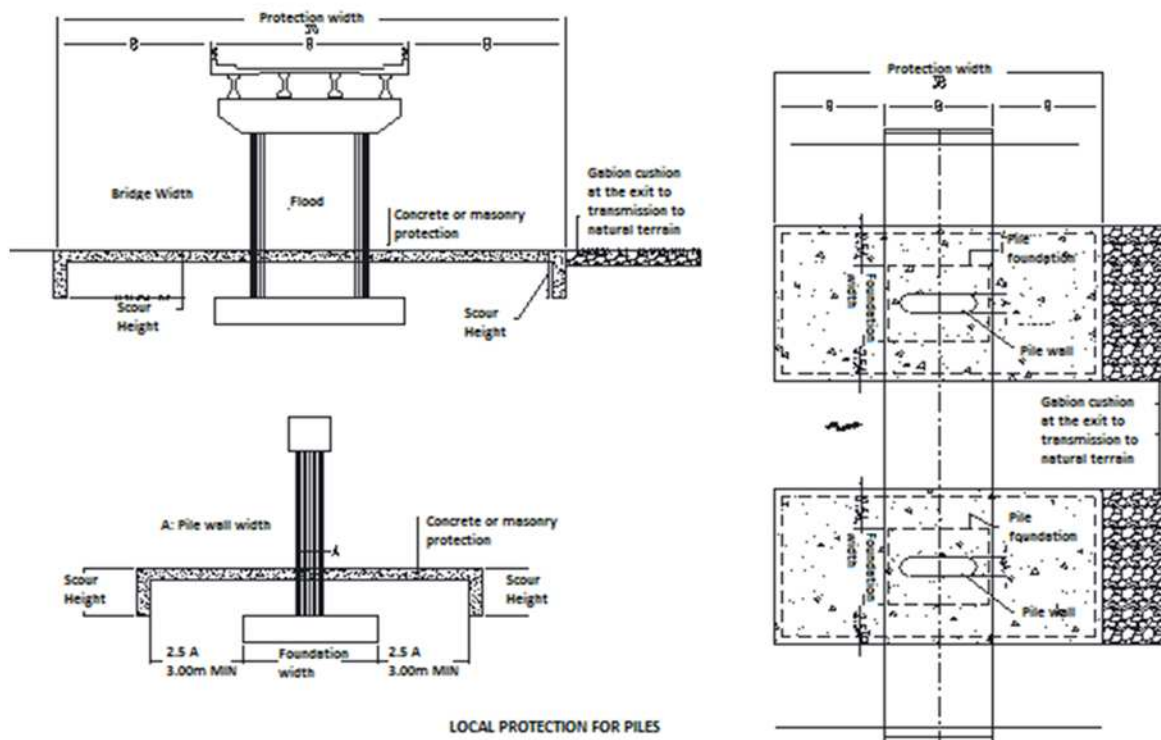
Local protection type on piles. (SPOP, 2014)
